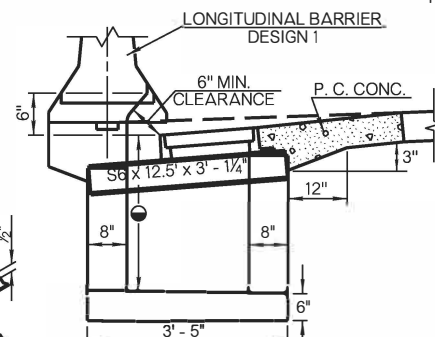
DETAIL OF TRANSITION SECTION AT BRIDGE PIERS
